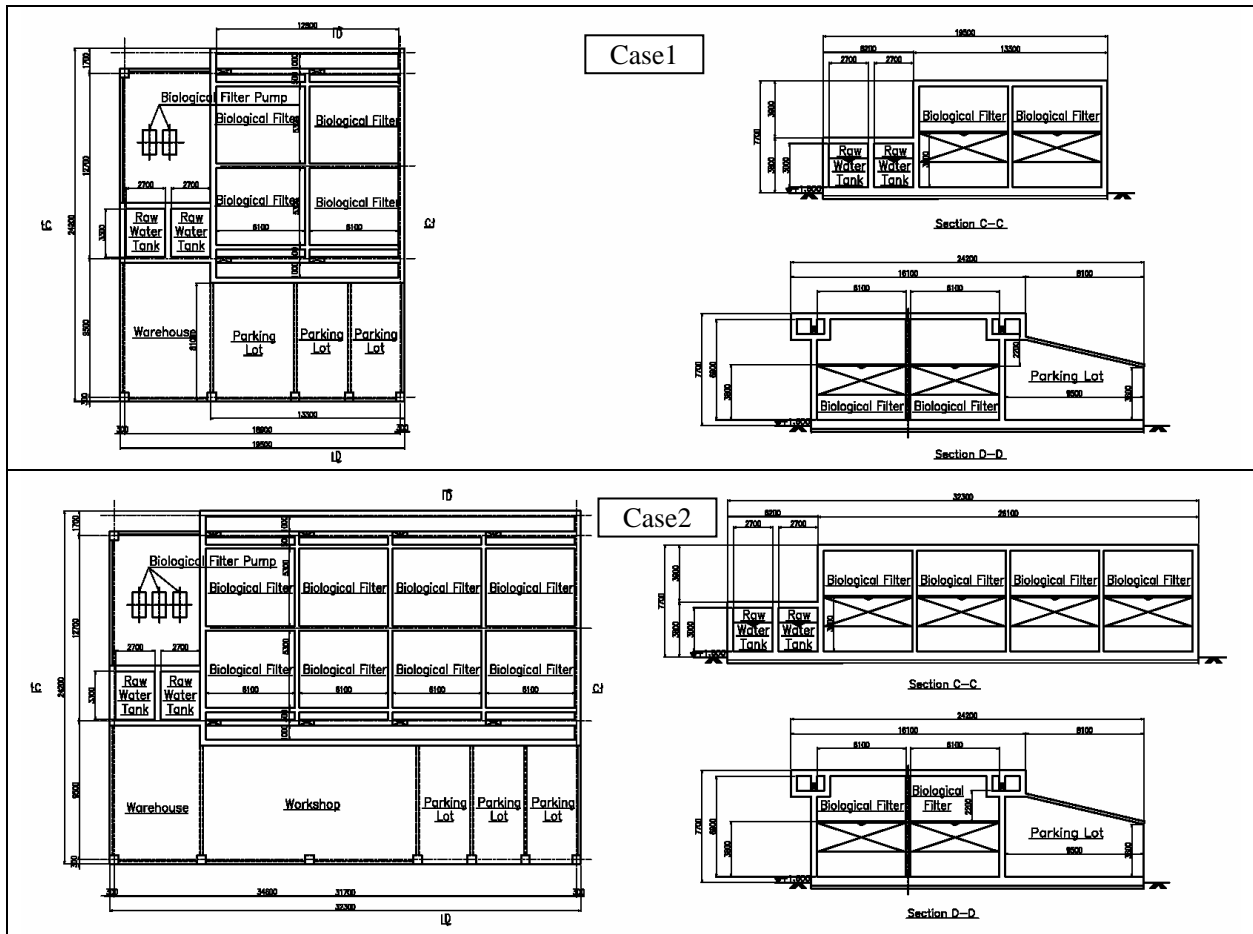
Plan and Section of Biological Filtration Process Building
